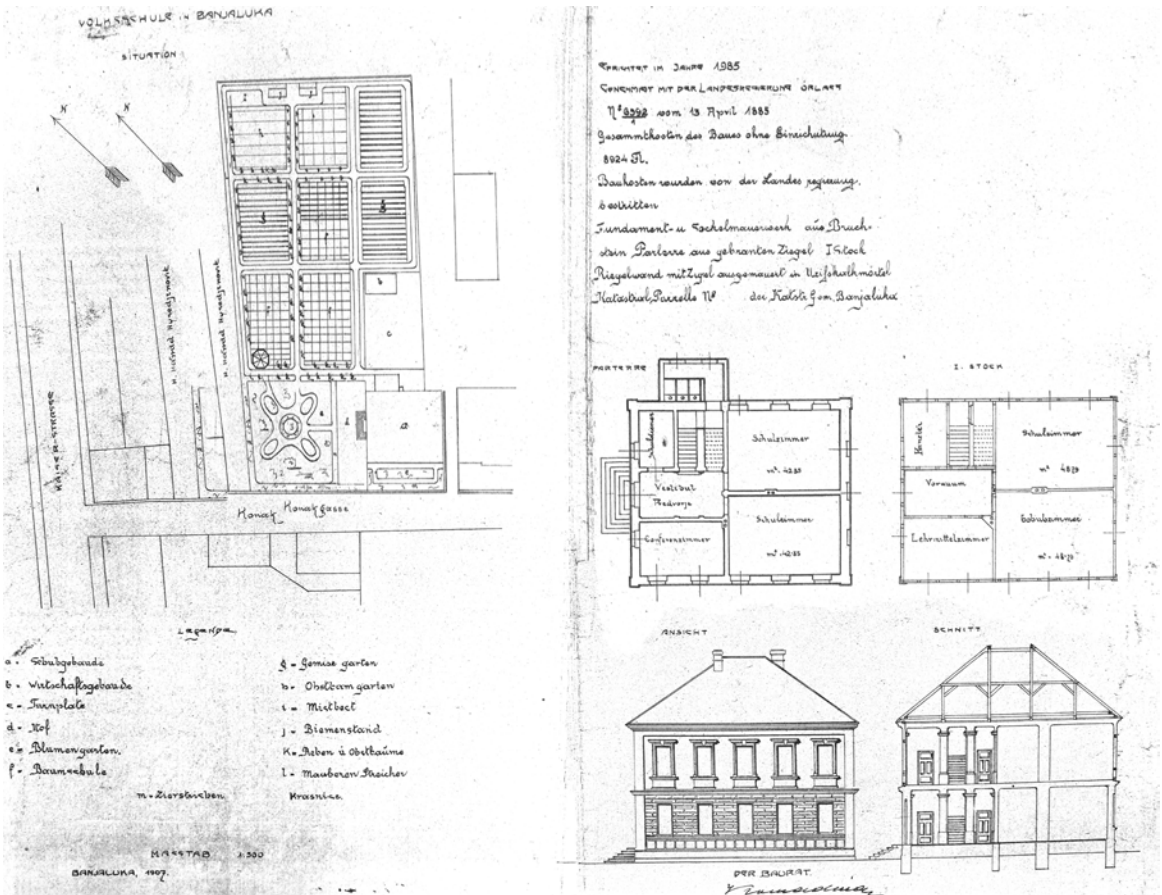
Tsar’s school; original project documentation with site plan, floor plans, section and elevation views. Drawings dated in 1907.
